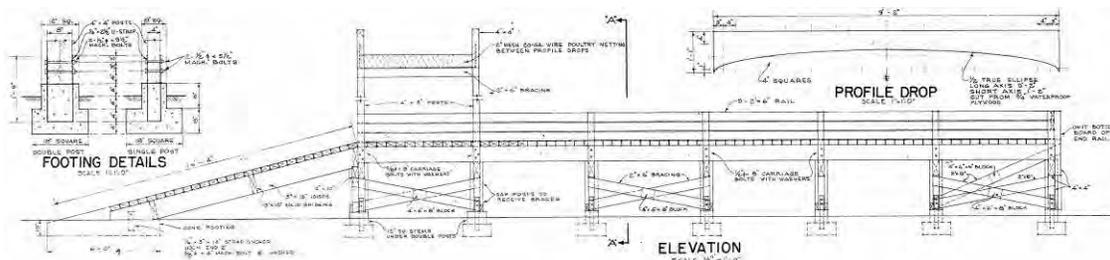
C-119 mock-up for air movement training, frame construction, elevation, and details, Fort Bragg, NC, 1951 (standard drawing 28-13-53 sheet 1 of 1; C-119 mock-up for air movement training, frame construction, plans, and details; 7 December 1951).
